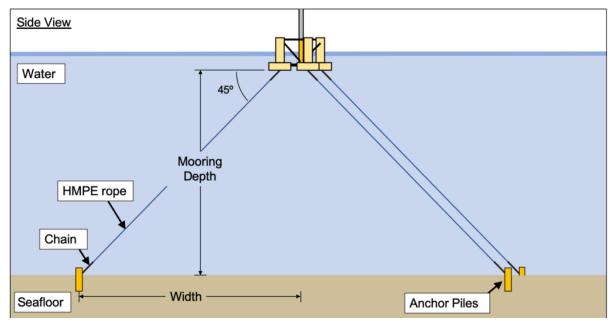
Side view of platforms with taut-leg mooring and anchor piles. Drawing not to scale.
